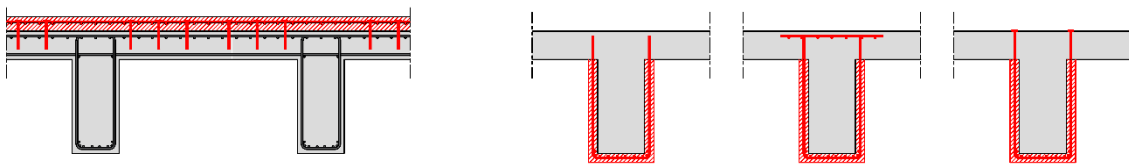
In-situ concrete layer as strengthening of a slab (left) and cross section supplement for a tee-beam (right, both adapted from [15]).
